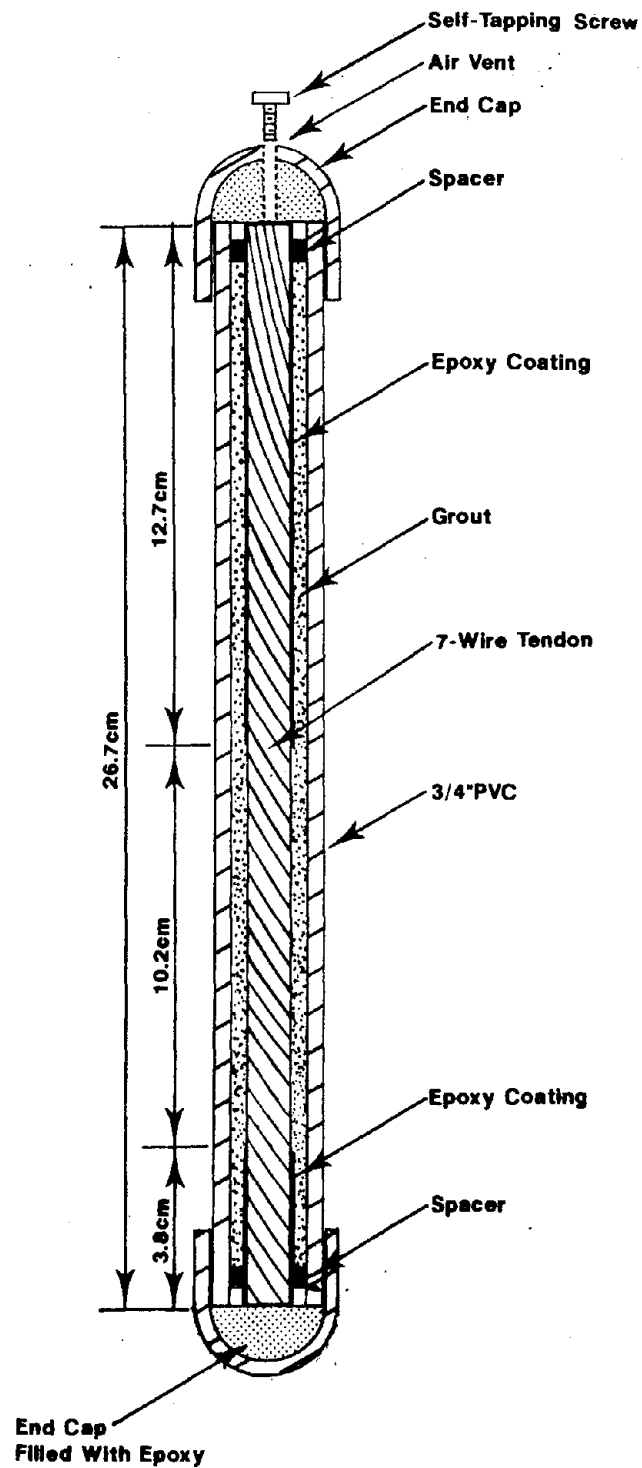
Schematic diagram of grouted pipe specimen prior to cutting gauge section.
